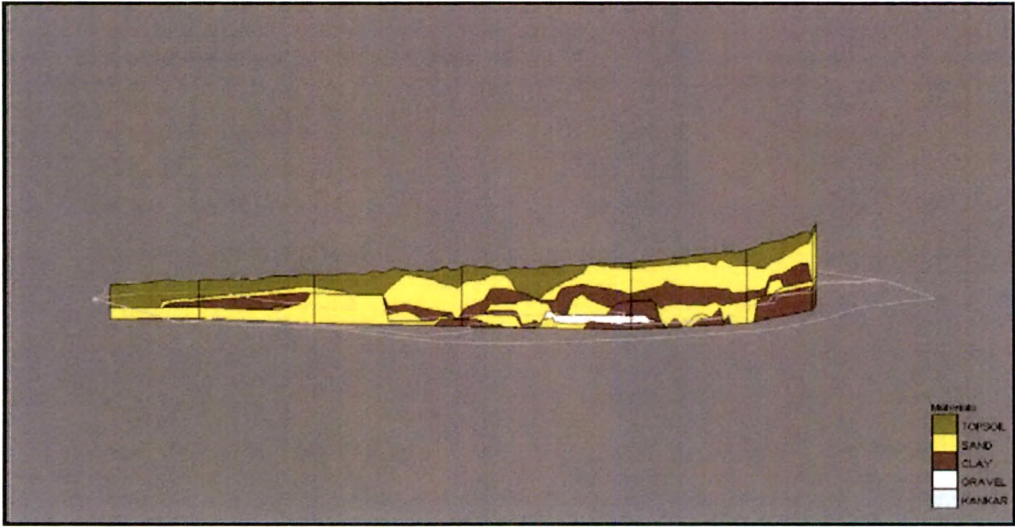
Longitudinal Section Along Right Bank (Section A-A')
